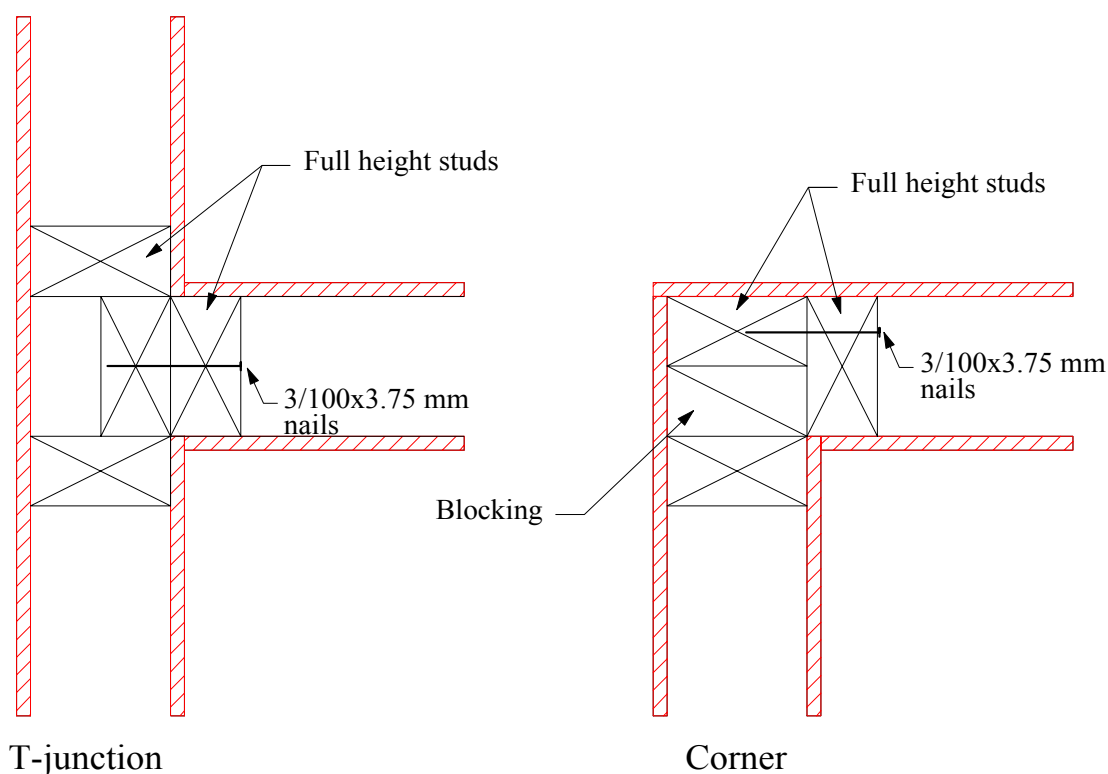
Typical wall junction showing continuity construction affecting uplift restraint.
